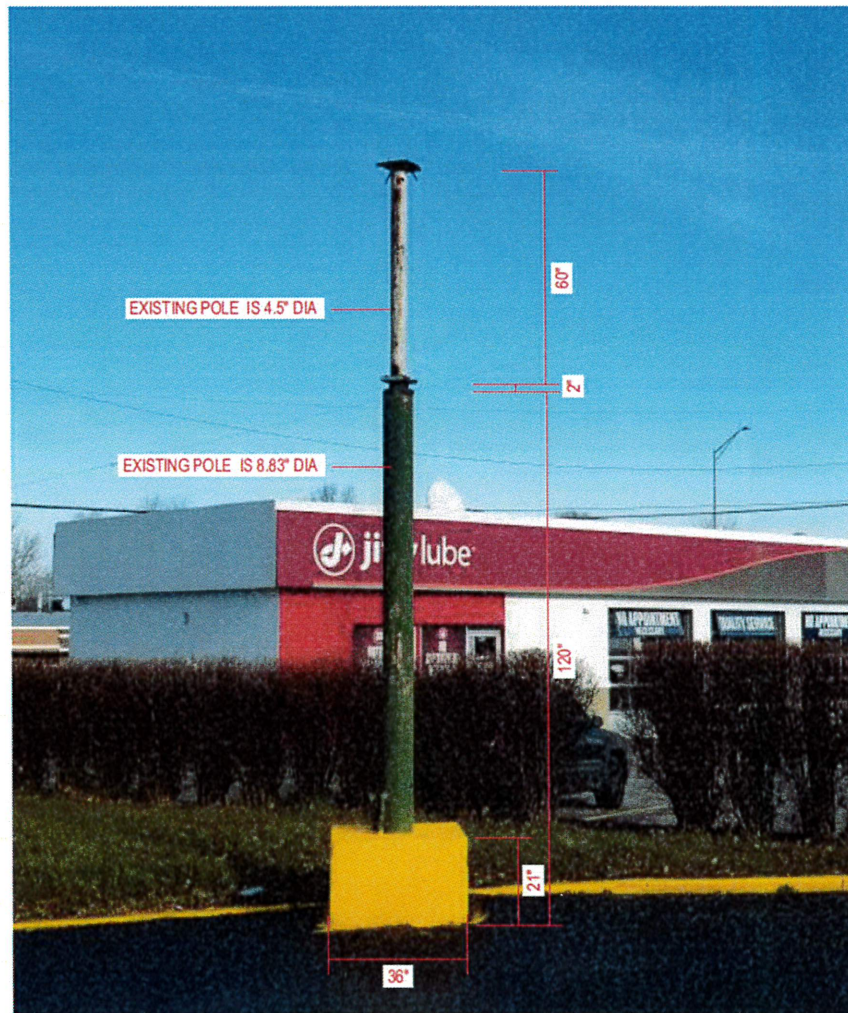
PHOTO SURVEY OF EXISTING- DUNDEE ROAD
